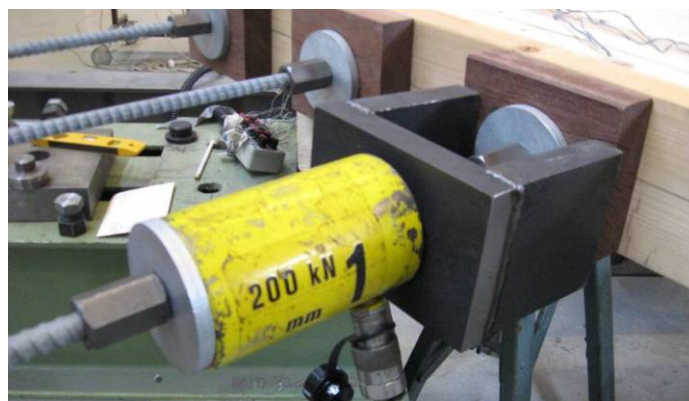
Hydraulic jack used to pre-stress each steel bar. In the photo are also the steel plates and nuts needed to pre-stress the bars.
